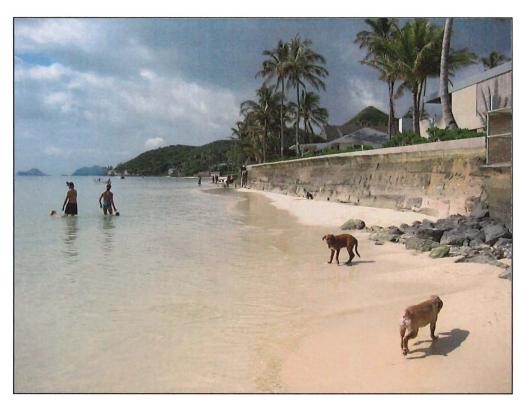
Typical concrete seawall providing hard shoreline protection
